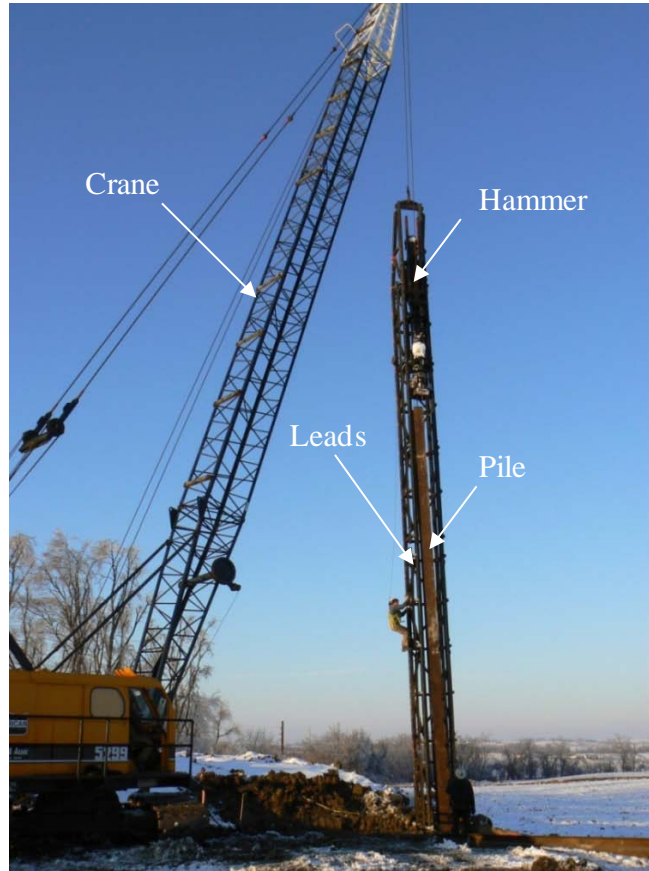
Crane, leads, hammer, and anchor pile lifted and ready for driving
